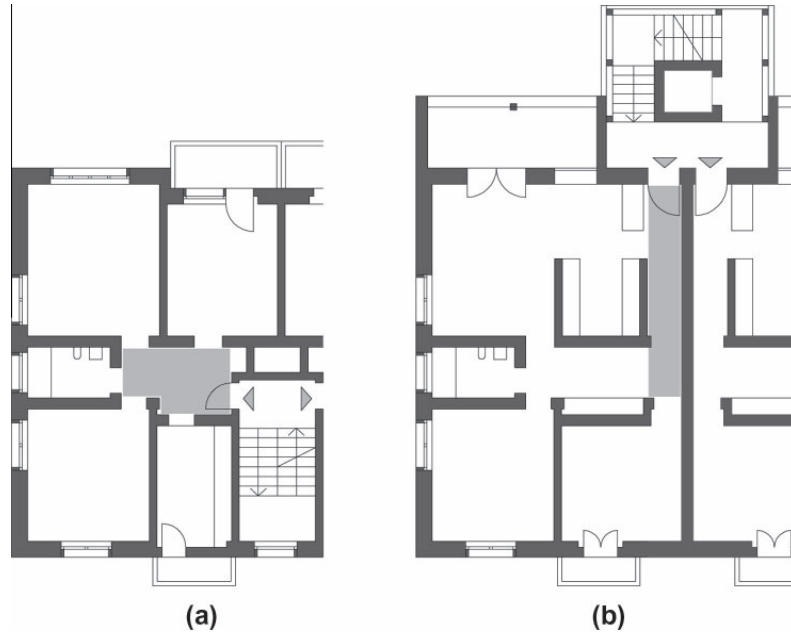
Plans of the first floor before (a) and after (b) the dwelling renovation. Space closure of the hall area. Residential building, Chur, Switzerland. © [Detail]. Reproduced by permission of detail.
